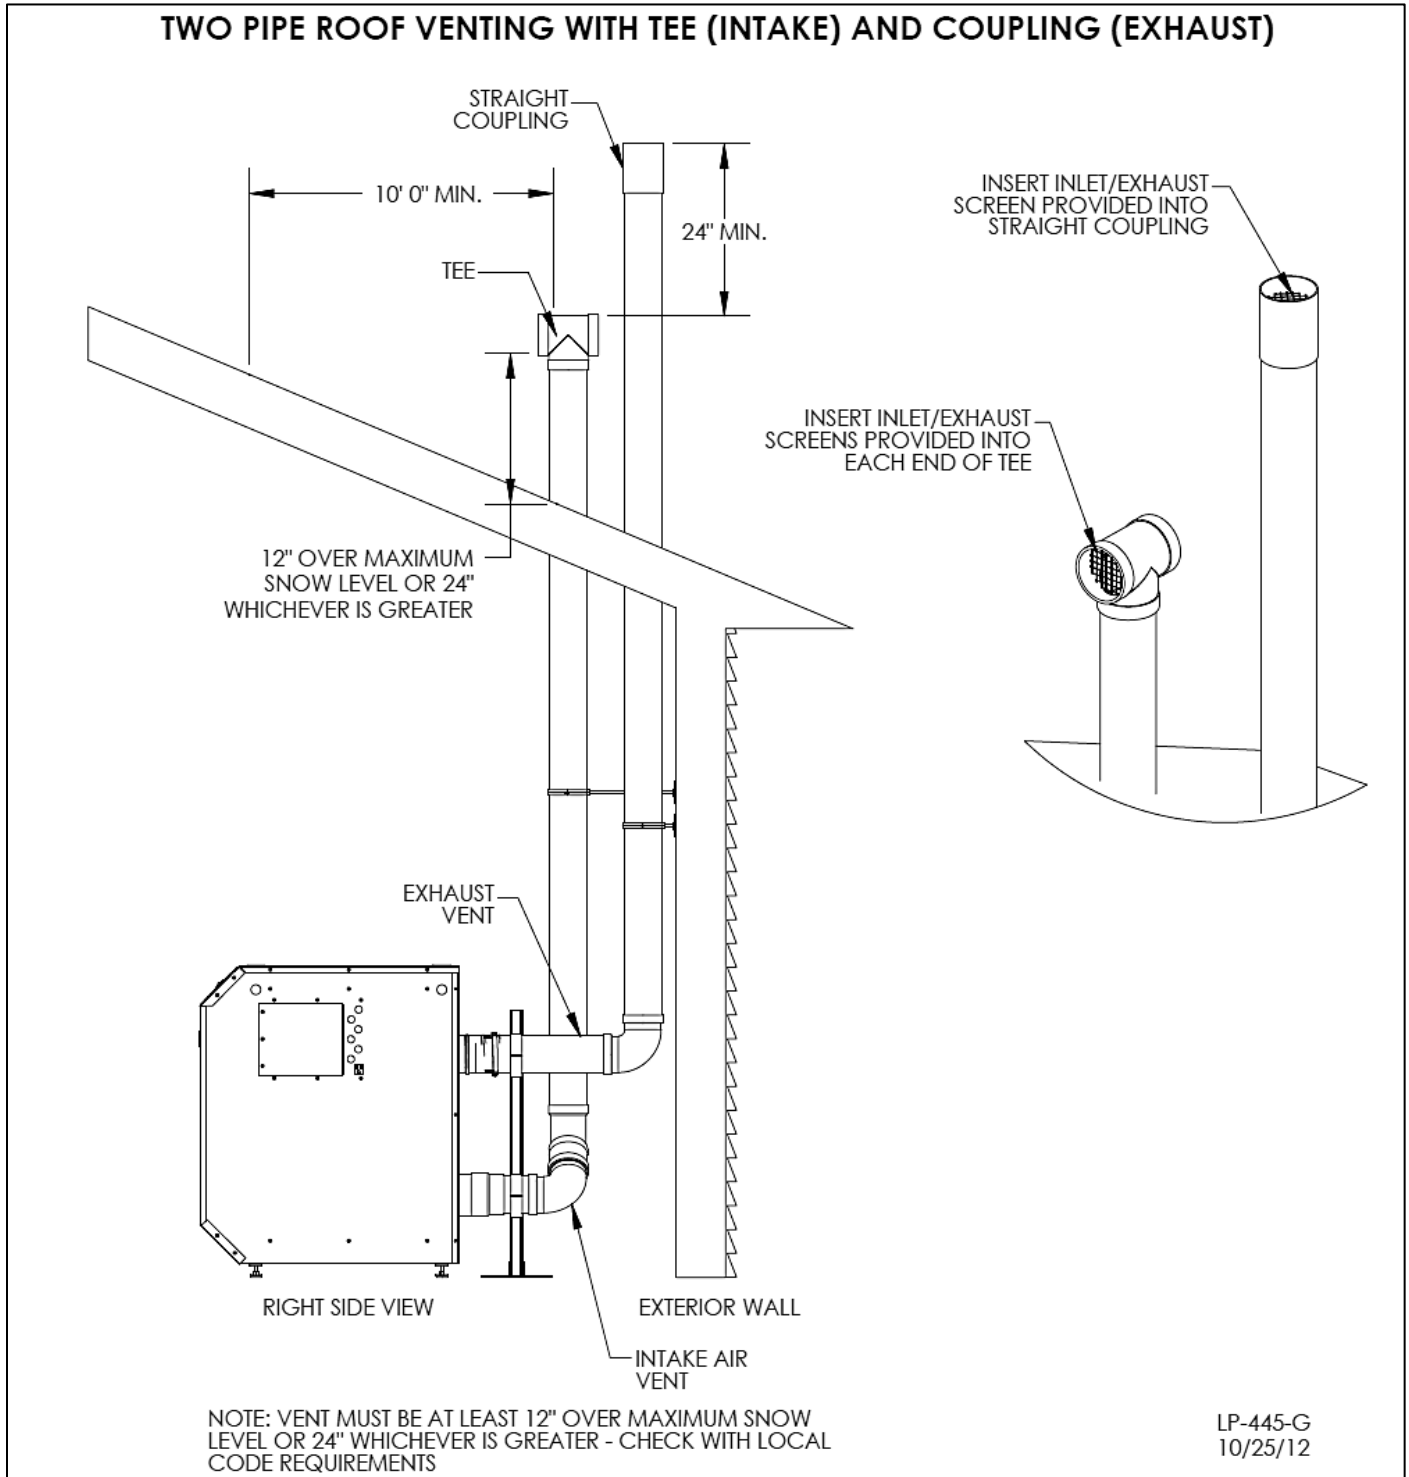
Two Pipe Roof Venting with Tee and Coupling
